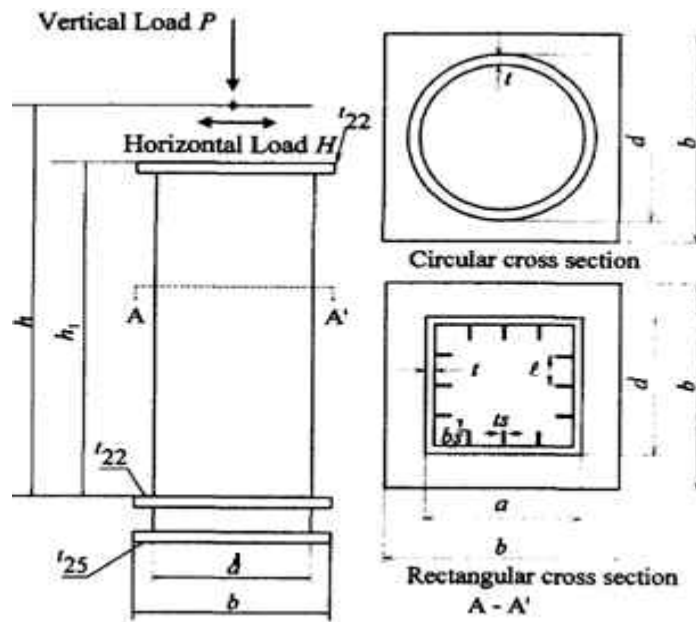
Detailing of the cross section of specimen (Nishikawa *et al.*, 1996).
